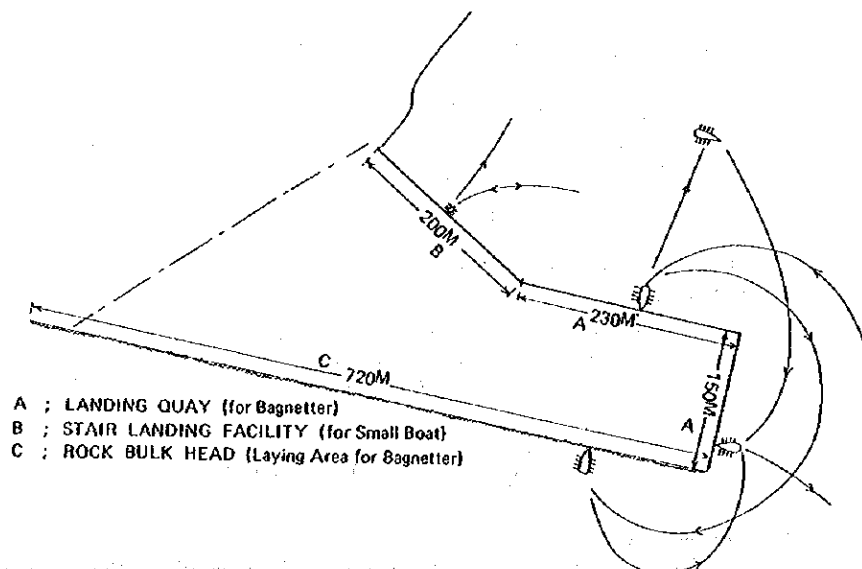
Zamboanga Fishing Port Basic Facilities Layout and Utilization Diagram.
